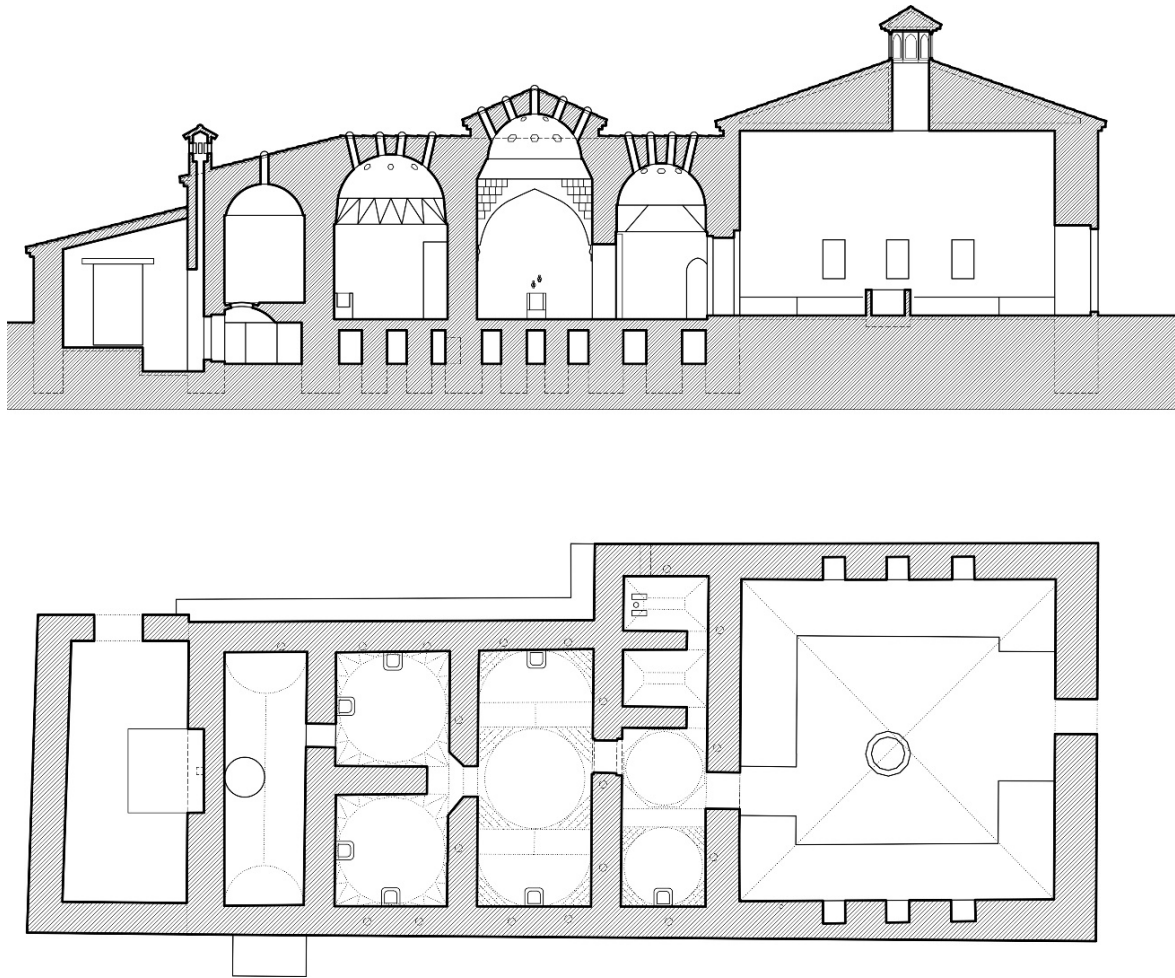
Plan and sections of restitution work for the Mahmud Pasha Hammam
